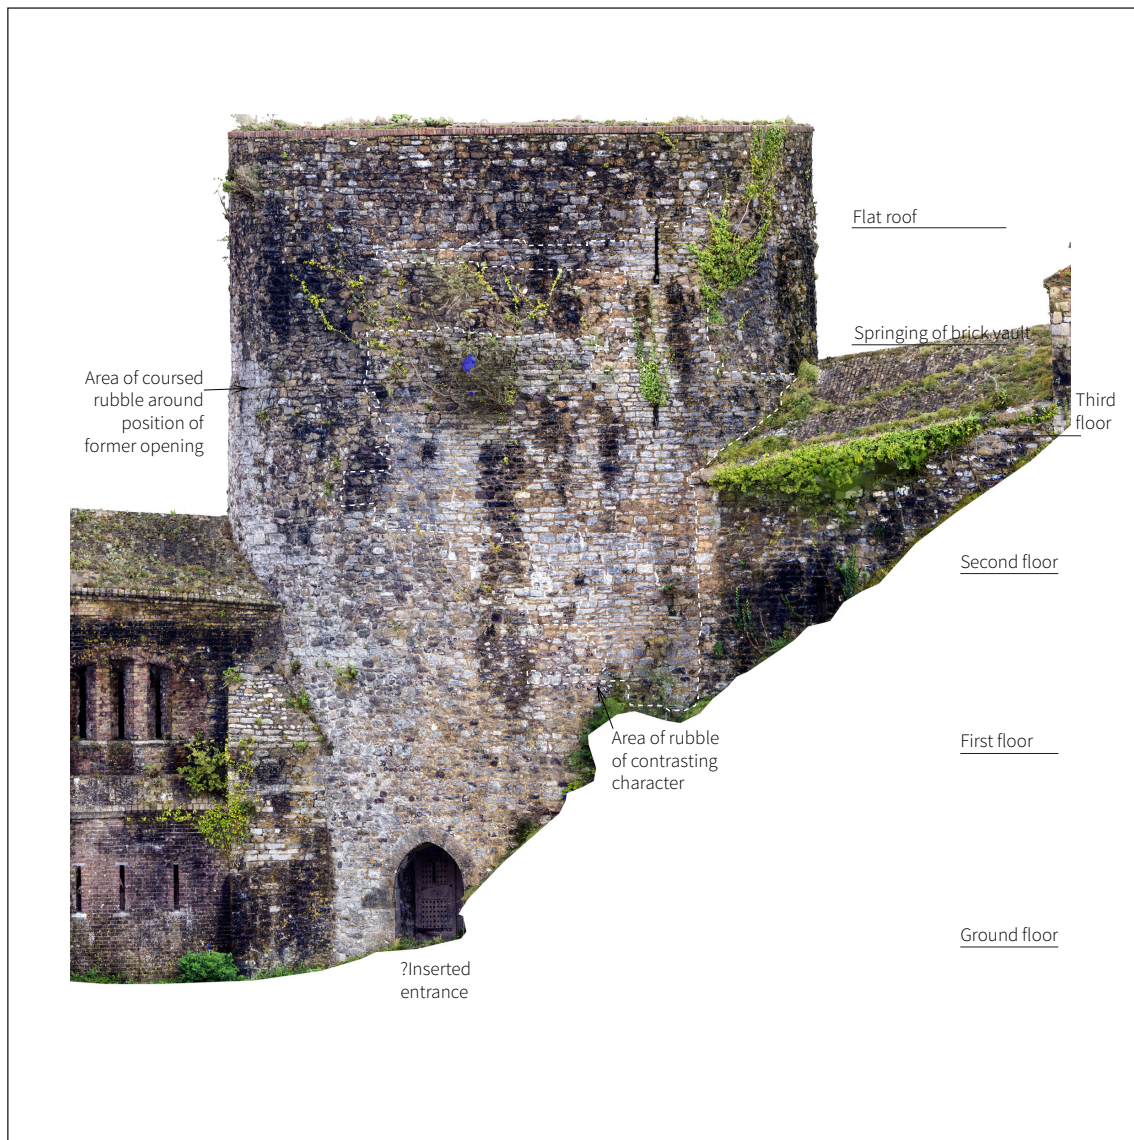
West elevation, St John's Tower (Photogrammetry courtesy of English Heritage)
